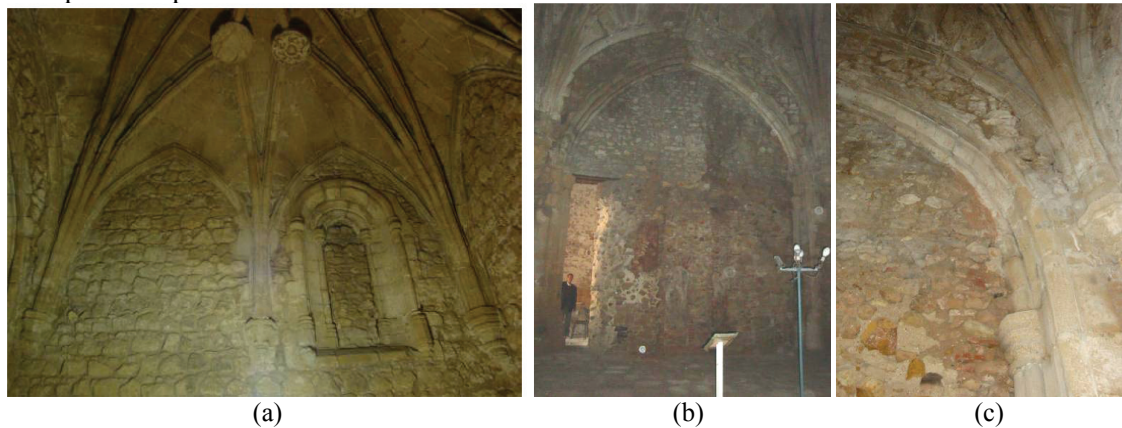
Main chapel: (a) elevation in south-west direction; (b) inner view in south-west direction (former hammam); and (c) detail of encounter of pointed arch, diagonal rib and partition wall of south west elevation.
